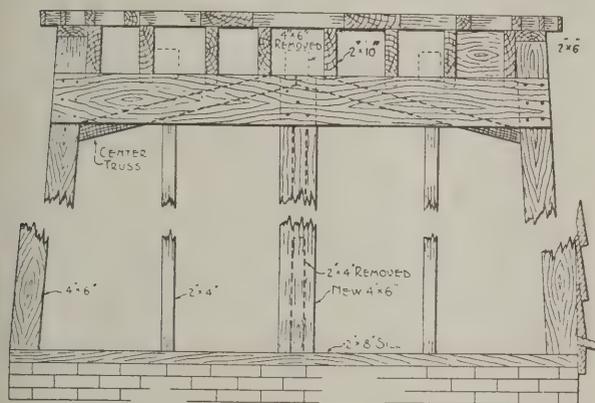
Broken Elevation of Tank Support, Showing Substituted Joists and Posts
